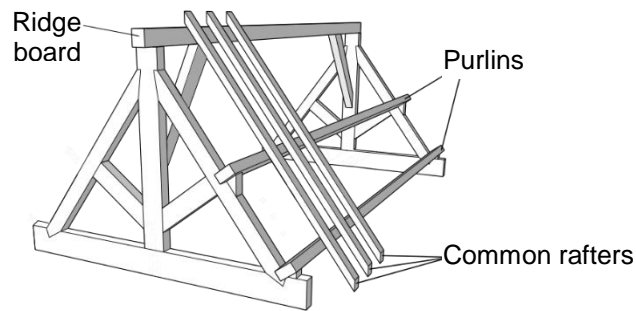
Connection of the timber trusses to form the structural roof system ("Timber Roof Truss" 2014).
